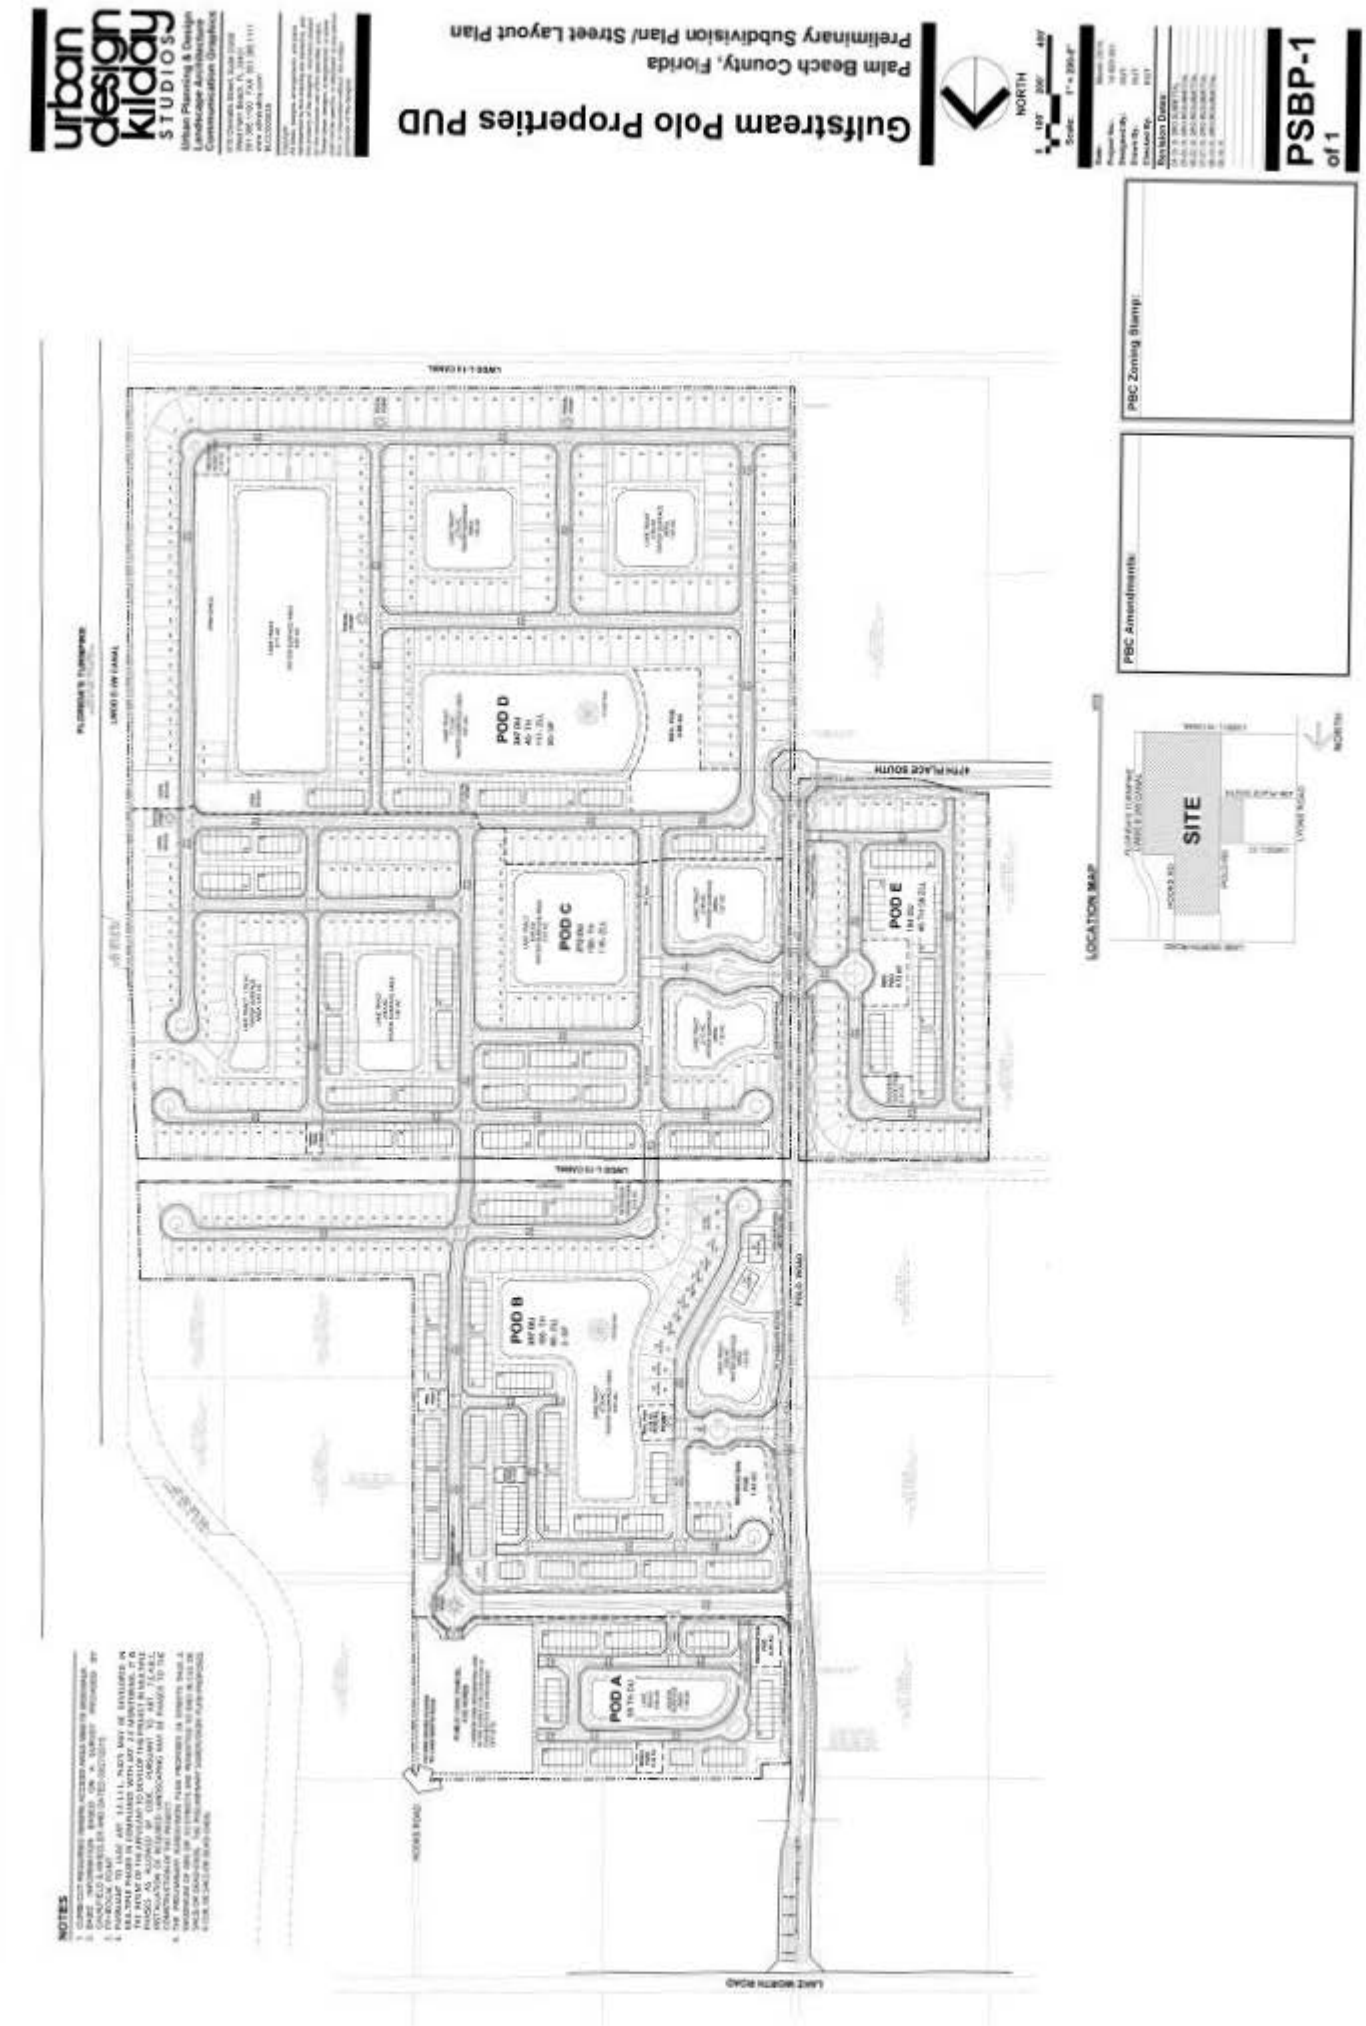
Preliminary Street Layout Plan dated August 25, 2015
